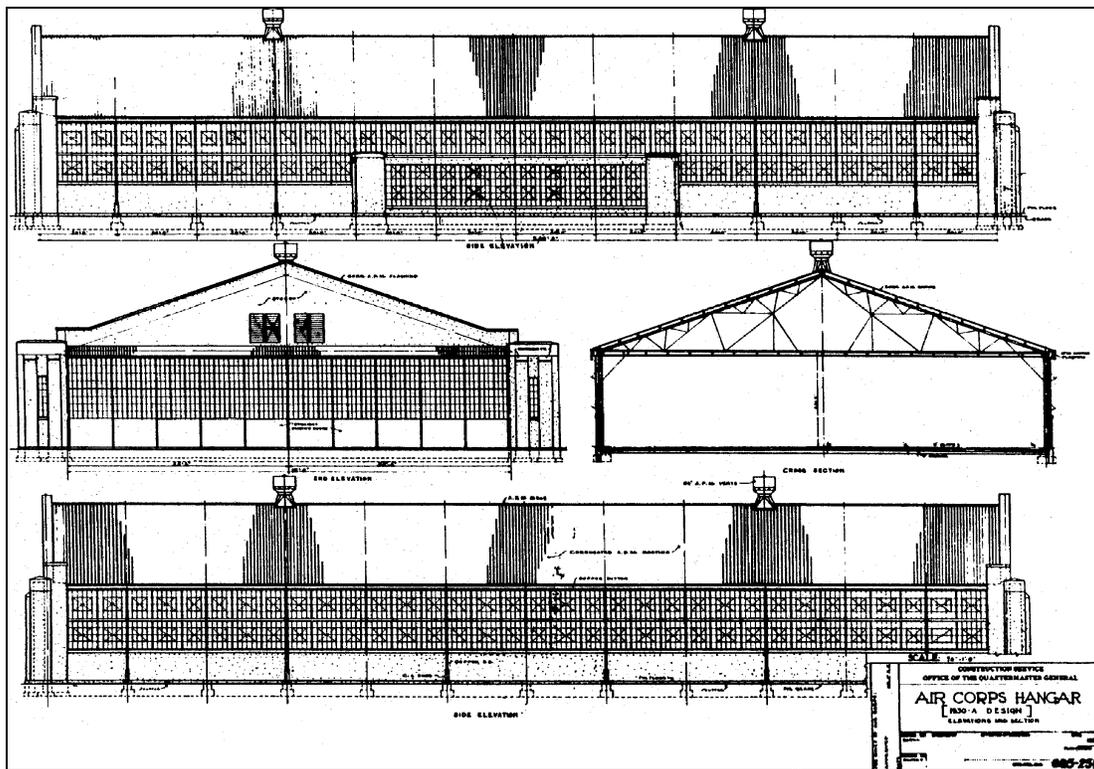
Plan No. 695-251, Air Corps 1930-A Design.
